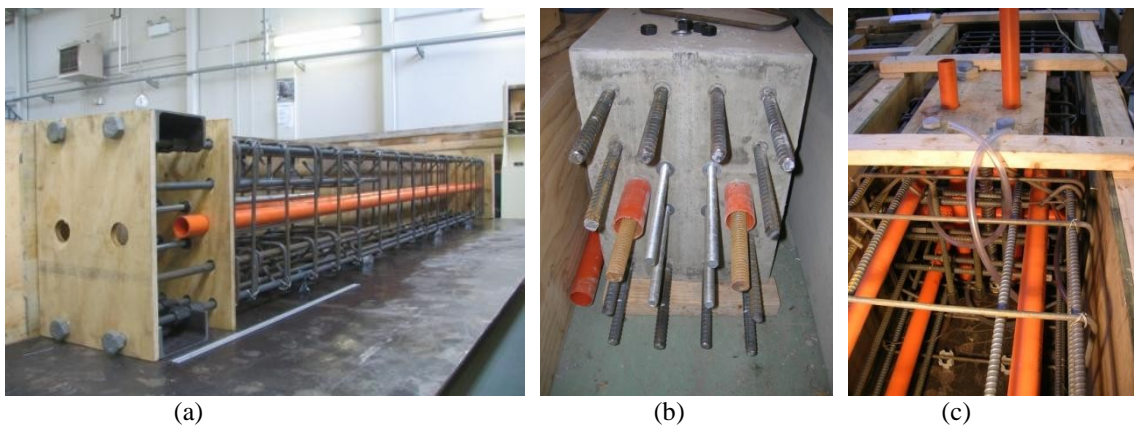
Photographs of the specimen: (a) the west beam reinforcing; (b) the precast east beam cast insitu end; (c) the reinforcing in the column joint.
